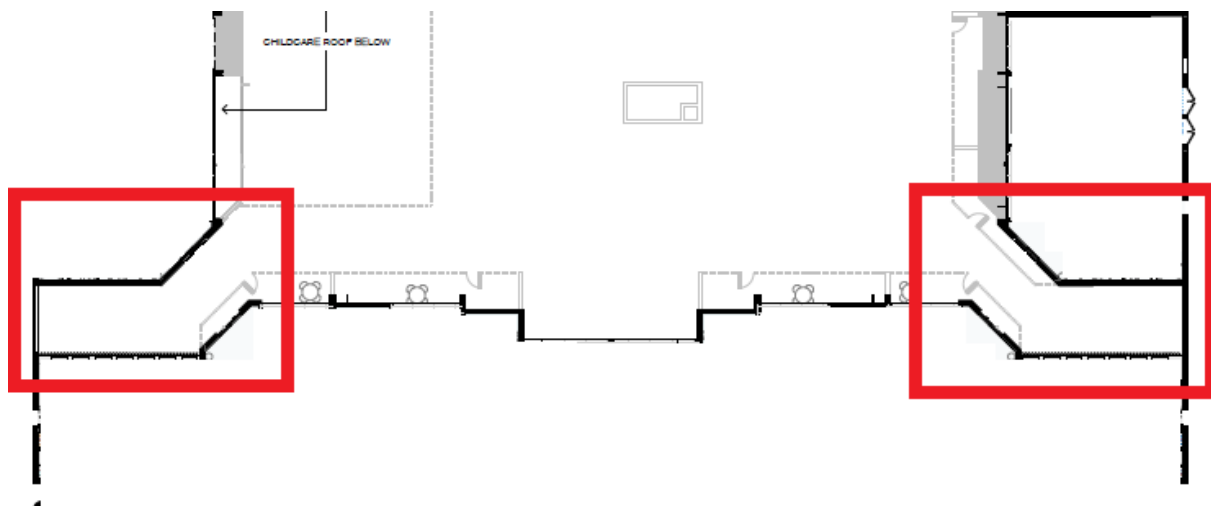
Extract from Level 3-4 plan highlighting the design element (redacted)
